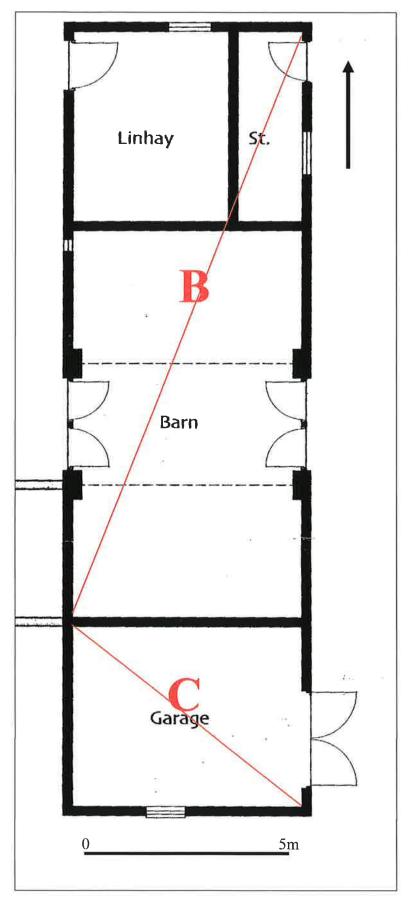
Plan of the Barn (Building B) and Cart Shed (or garage, Building C - 65 -
